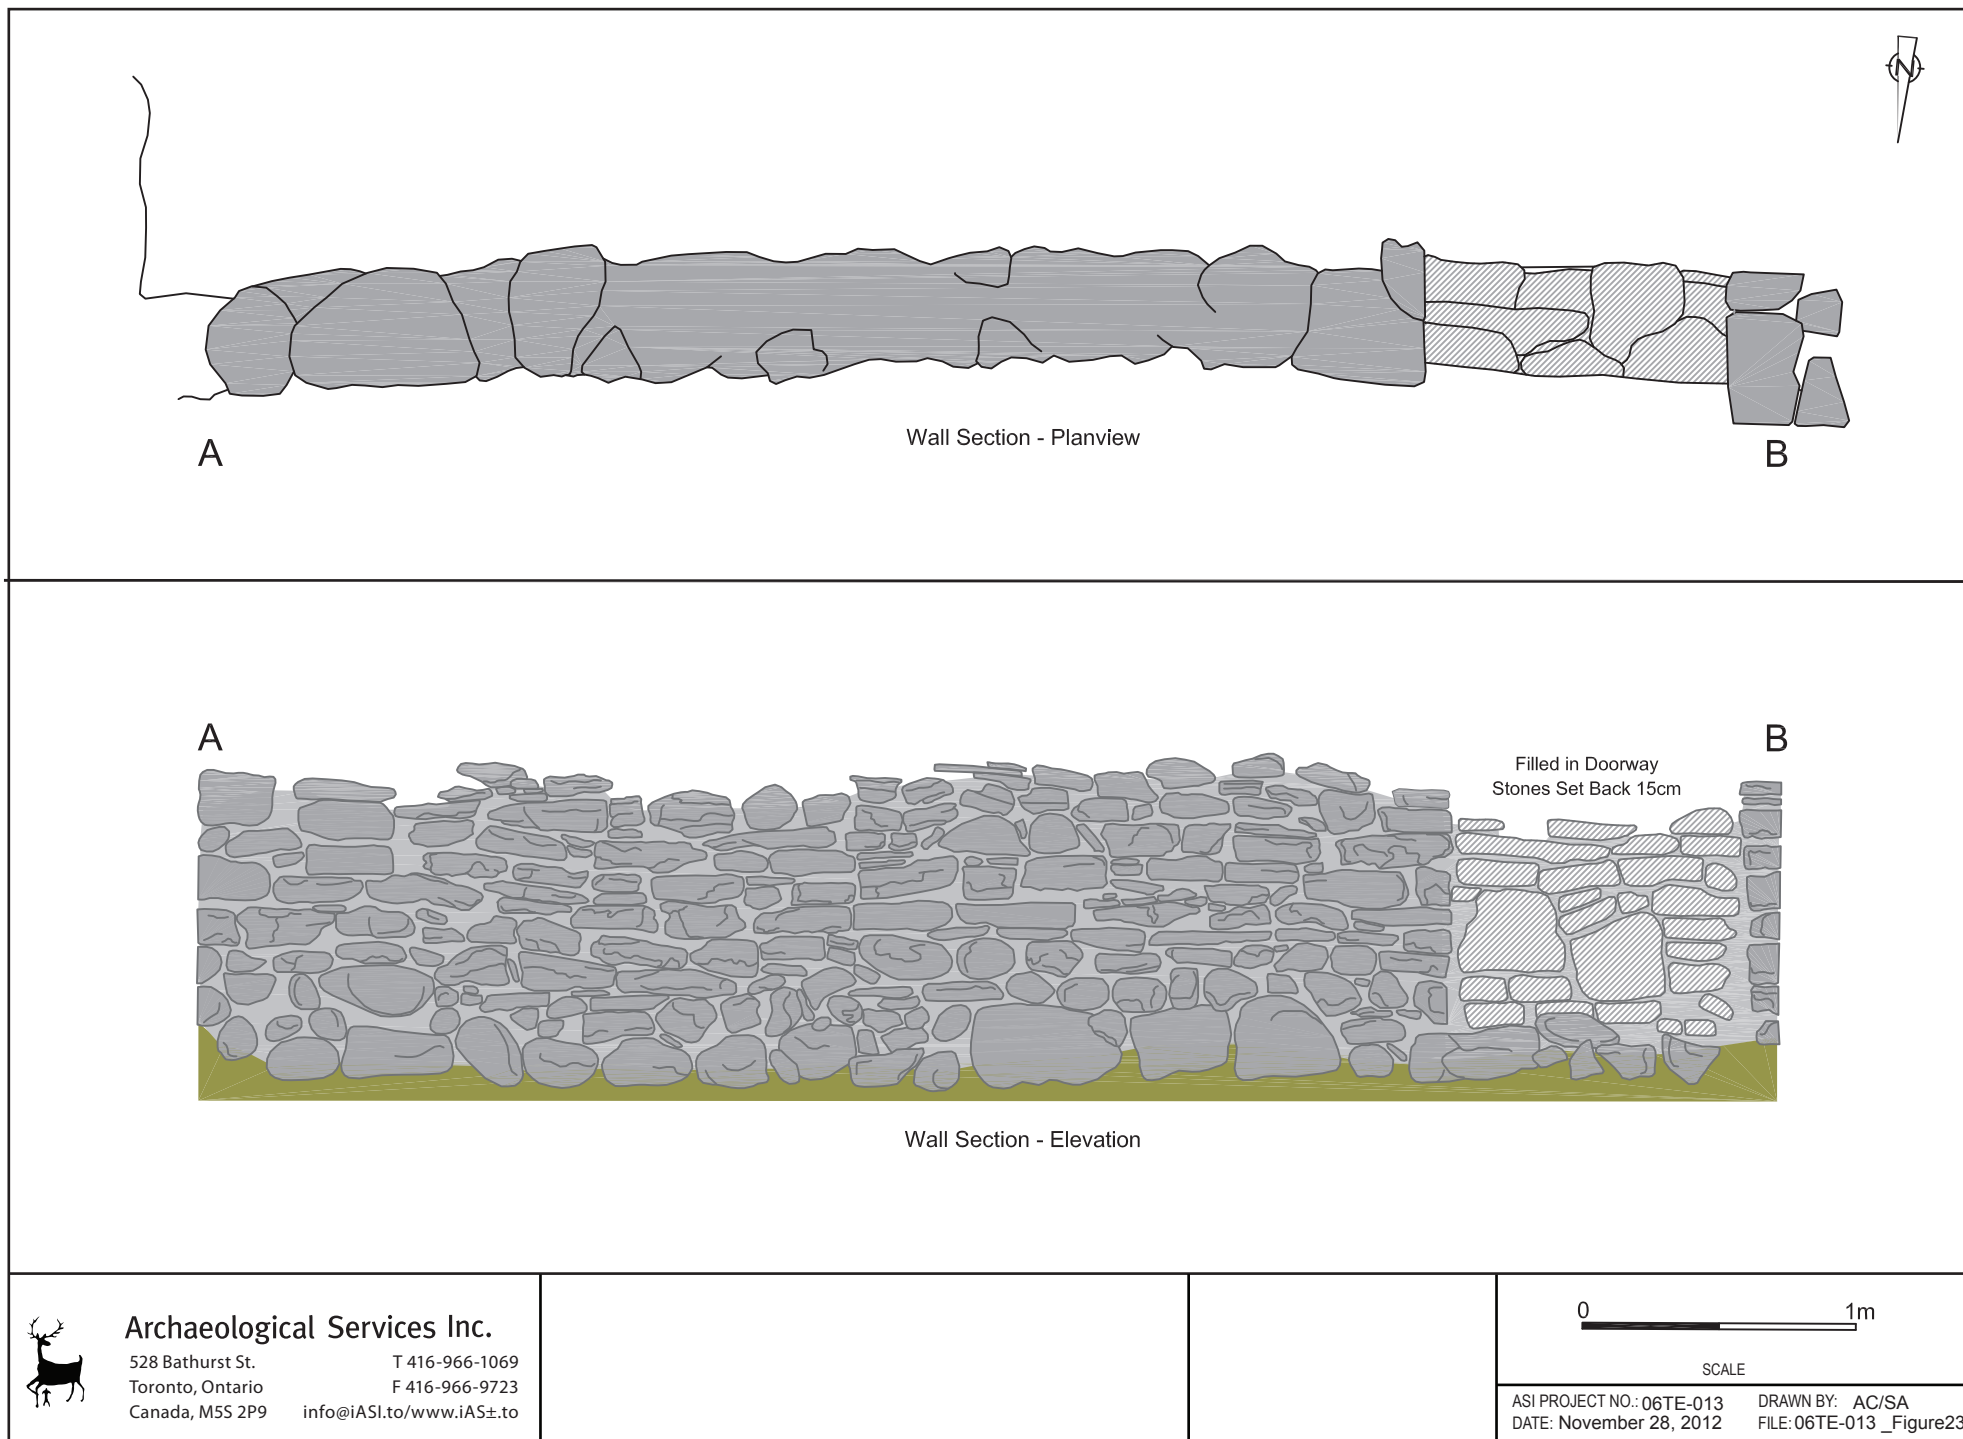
Trench 6 wall section detail, Townhouse 5 rear foundation.
